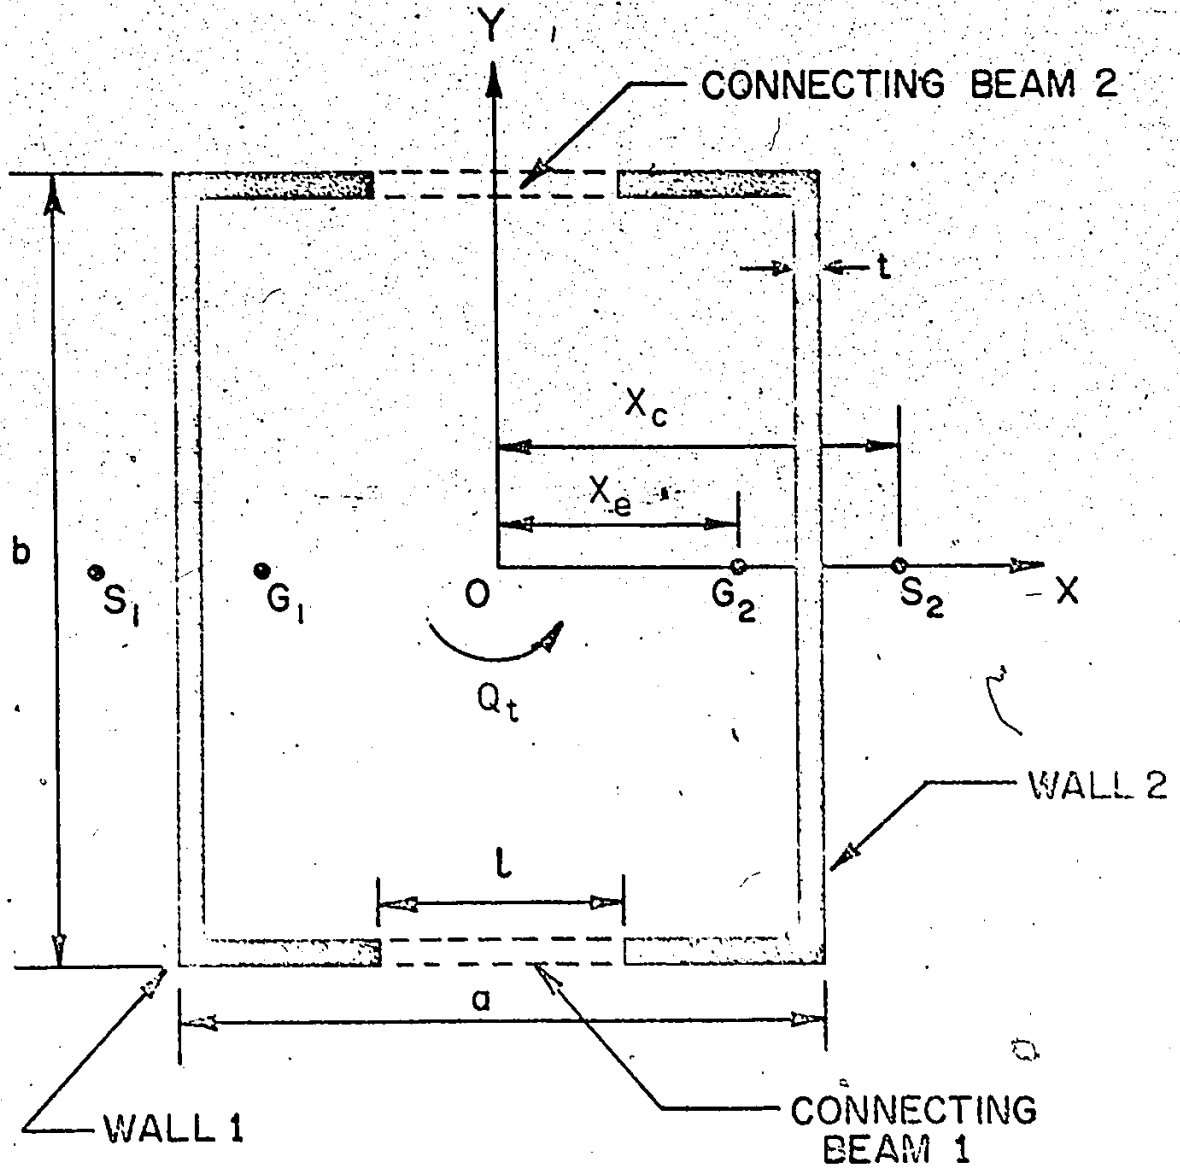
PLAN OF TWO WALL CORE STRUCTURE
